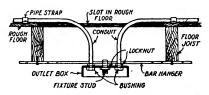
Method of Supporting Outlet Boxes and Fastening Conduit to Them
